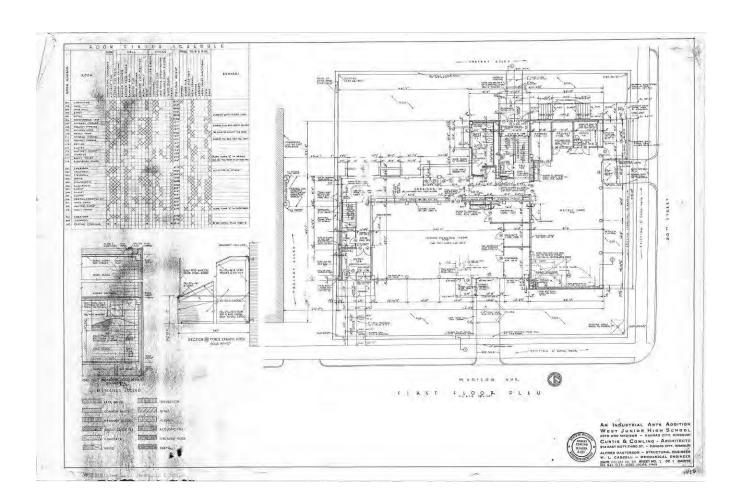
West Side Jr. High: Industrial Arts Addition 1954: First Floor Plan
